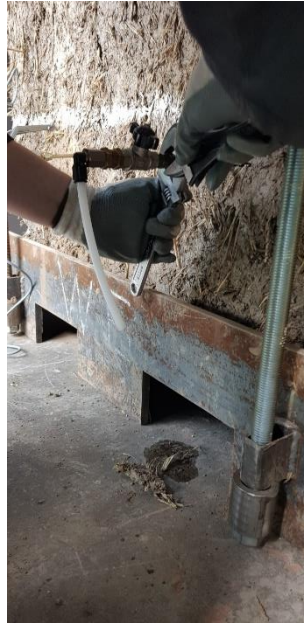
56. Oil leakage from a fitting piece between the outlet of the flat jack and the ball valve.
